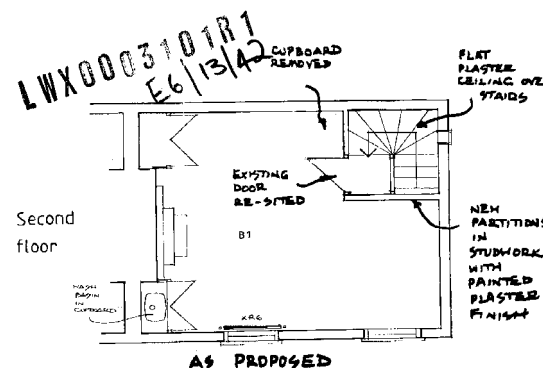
Excerpt from approved LBC drawing in 2001 to resite the 2nd floor bedroom door and removed an existing cupboard (See also Appendix VI).
